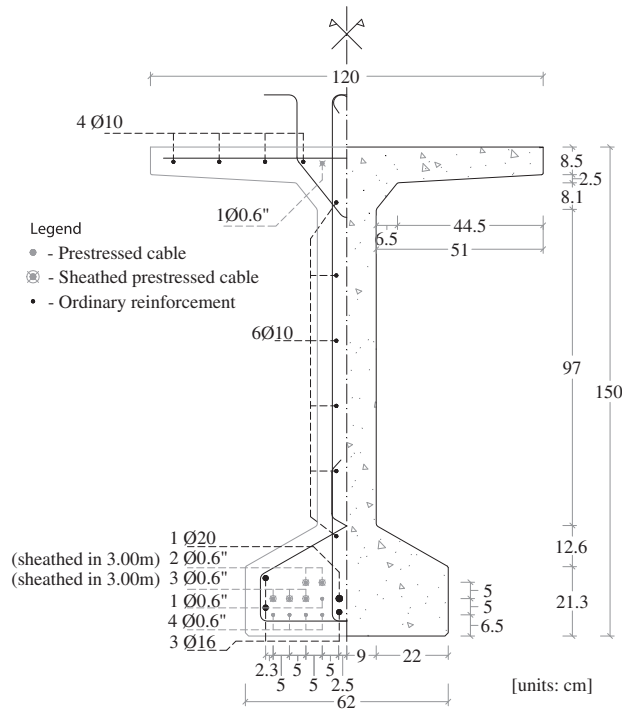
Geometry and rebar/prestress disposition of the prestressed beam at mid-span (sheathed stretches of strands correspond to the extremities of the beam).
